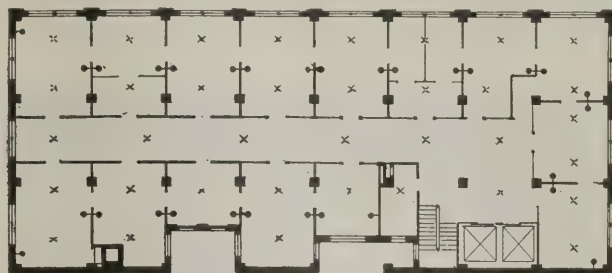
TYPICAL OFFICE FLOOR PLAN, SHOWING ARRANGEMENT OF LIGHTING UNITS AND RECEPTACLES.
